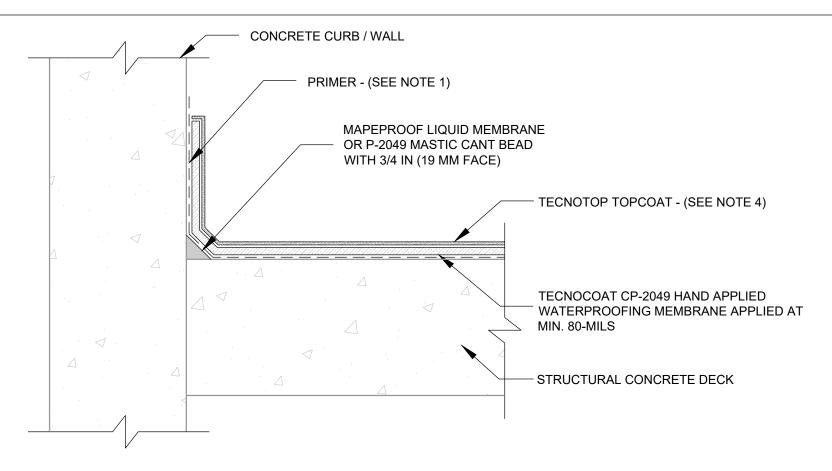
DETAILS ARE INTENDED TO BE A GUIDE FOR WATERPROOFING INSTALLATION ONLY
